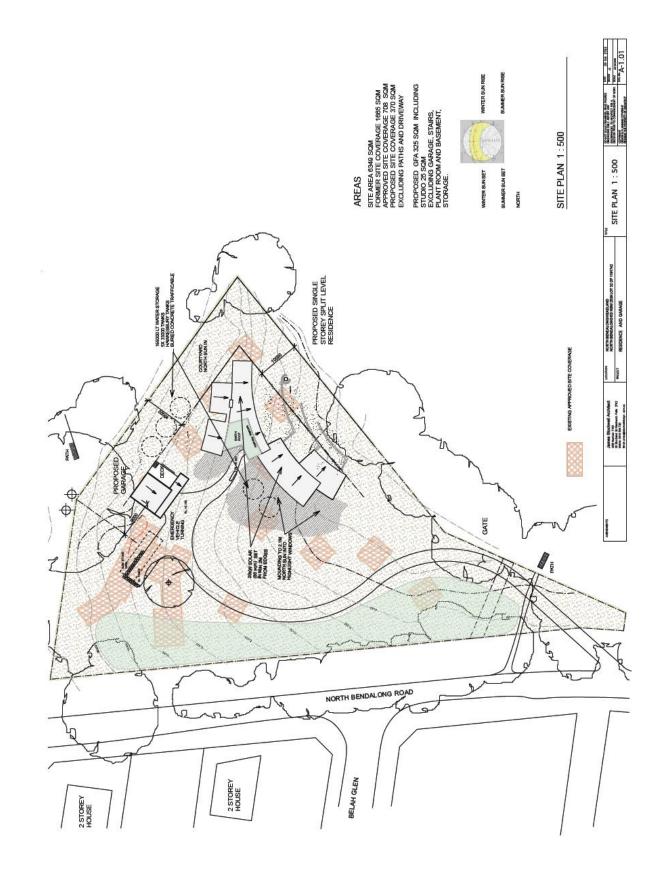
Extract of Site Plan prepared by James Stockwell Architect
